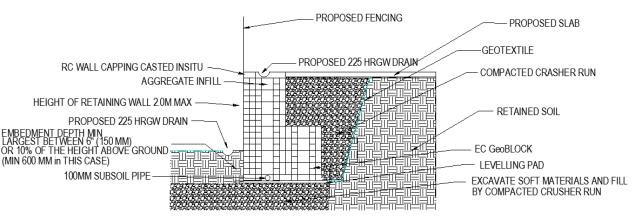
Section views of EC Geoblock gravity retaining wall at actual site
